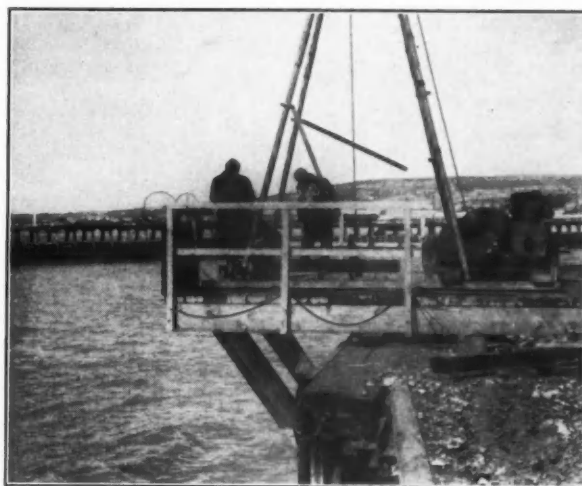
Shell and Auger boring rig on cantilevered platform. Derrick being erected.
